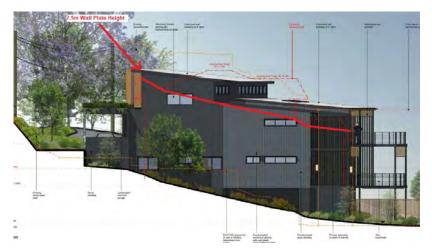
Wall Plate Height Non-Compliance (North Elevation)
